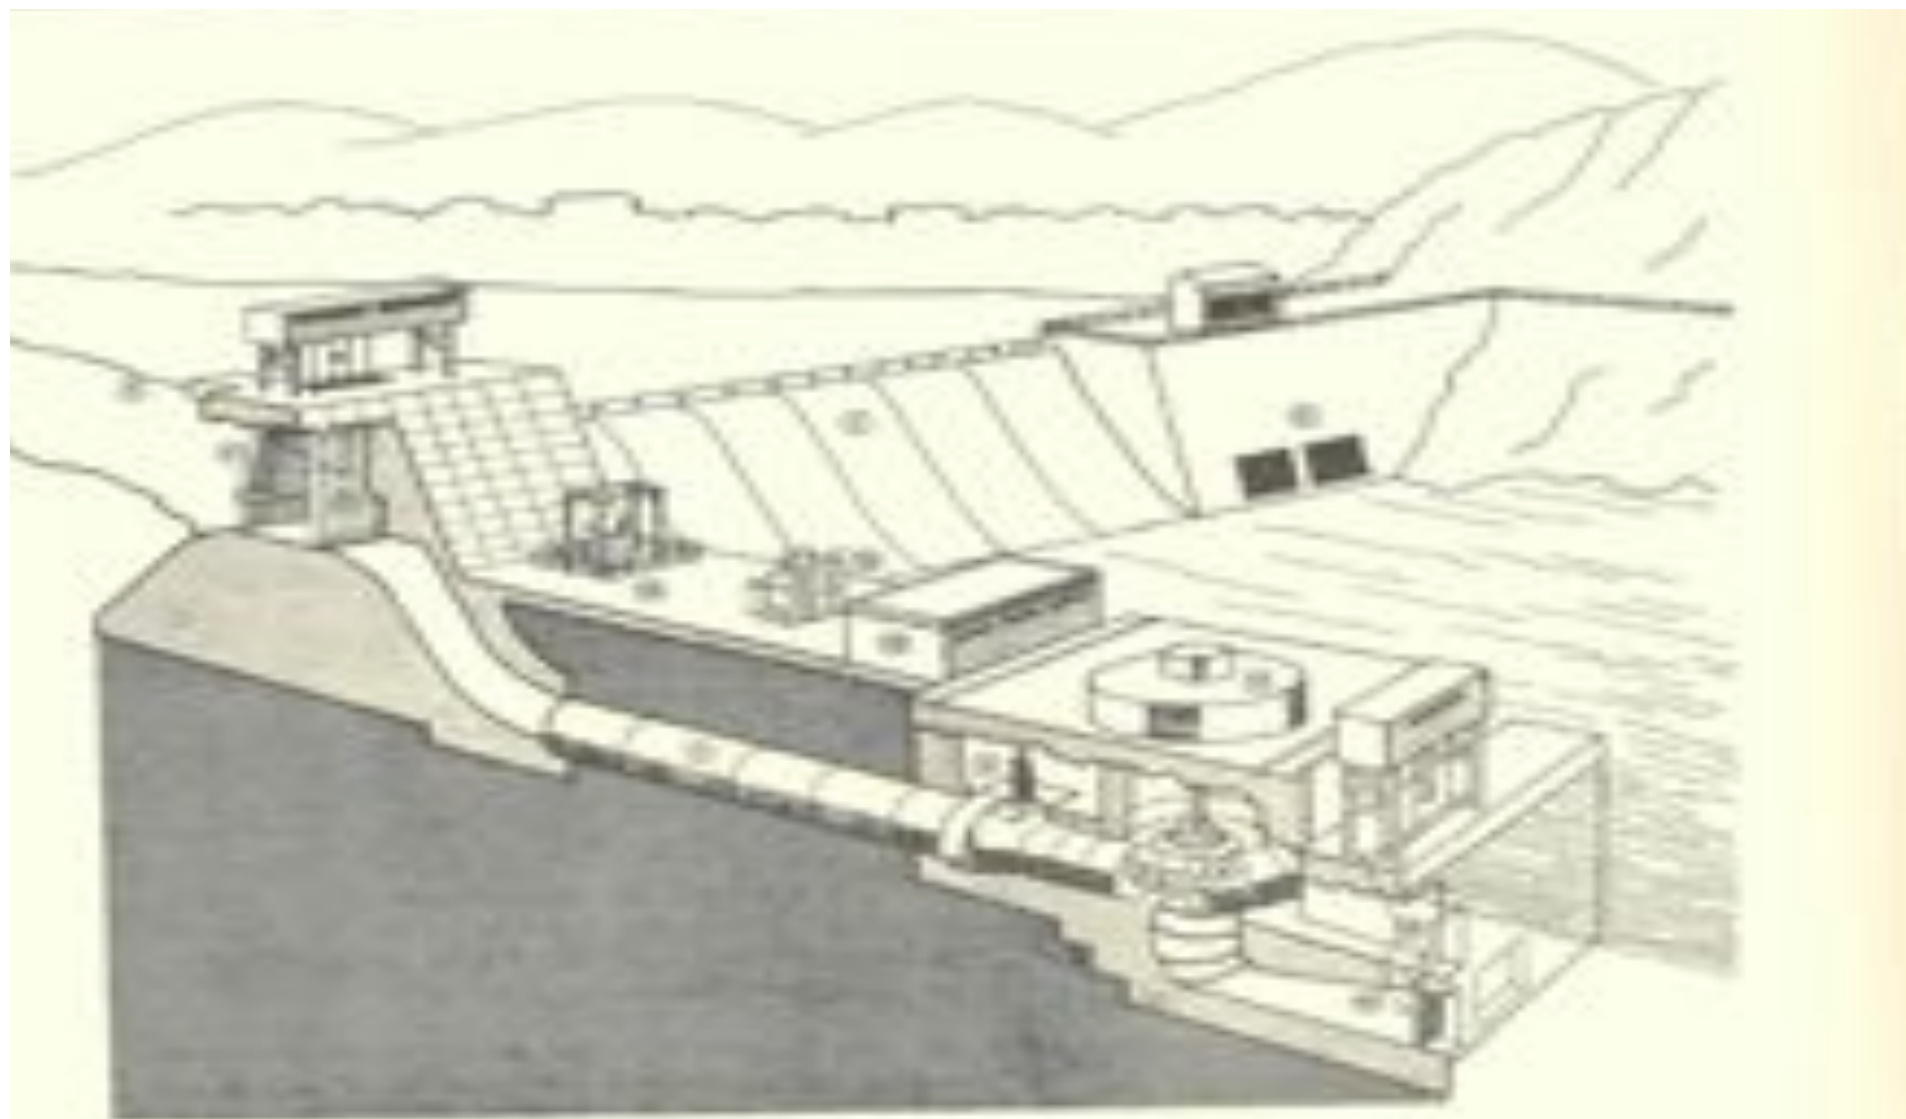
Typical Vermont Hydroelectric Installation. The walls of the powerhouse and intake structure are removed to illustrate the project works: (1) Dam with spillways, (2) water gate and gatehouse, (3) intake tunnel, (4) trash rack, (5) intake gate, (6) intake gate head, (7) penstock, (8) shaft and yoke, (9) turbine, (10) draft tube, (11) generator, (12) switch gear, (13) transformer, (14) circuit breaker, (15) draft tube gate and head.
